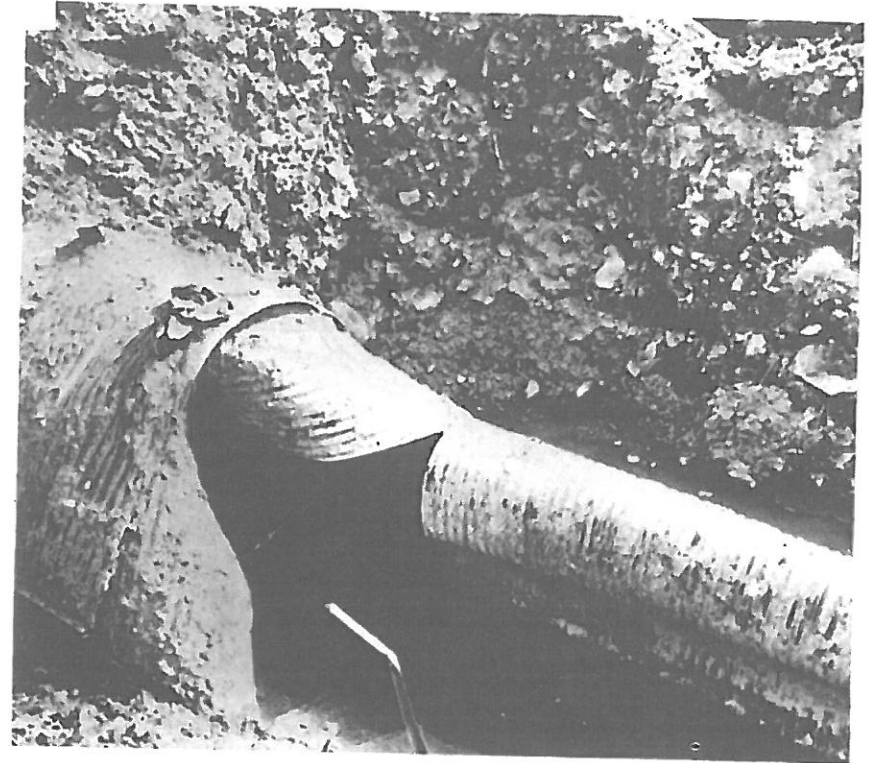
Failure by excessive deflection of an 84-in. corrugated steel pipe.
